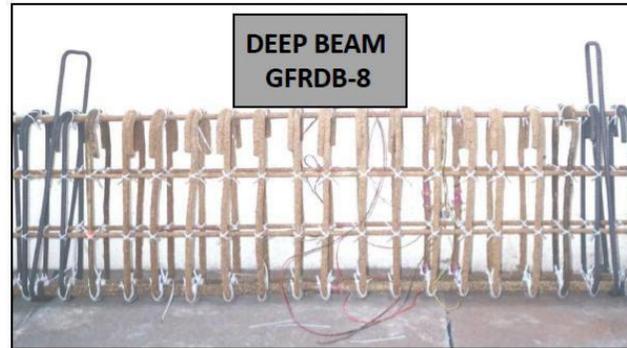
Binding of GFRP reinforcement for beam GFRDB-8
